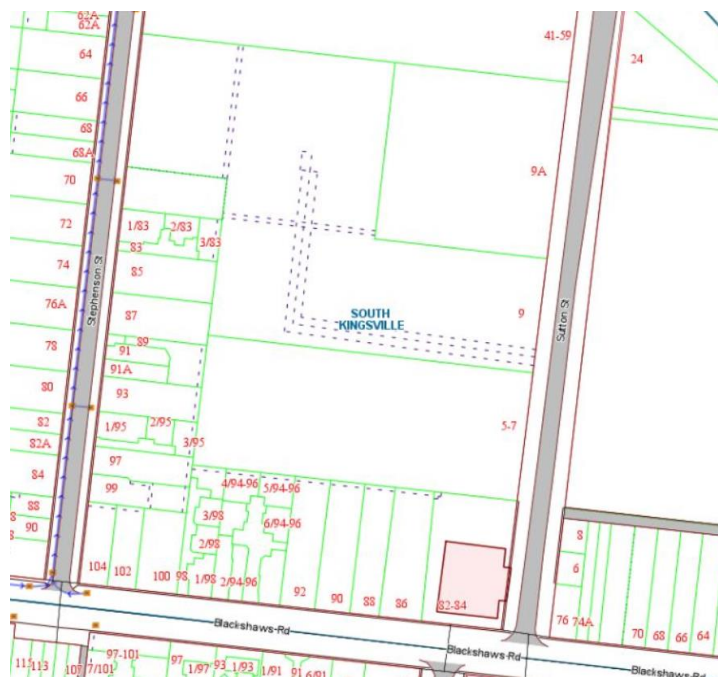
Hobsons Bay City Council Stormwater Asset Plan
